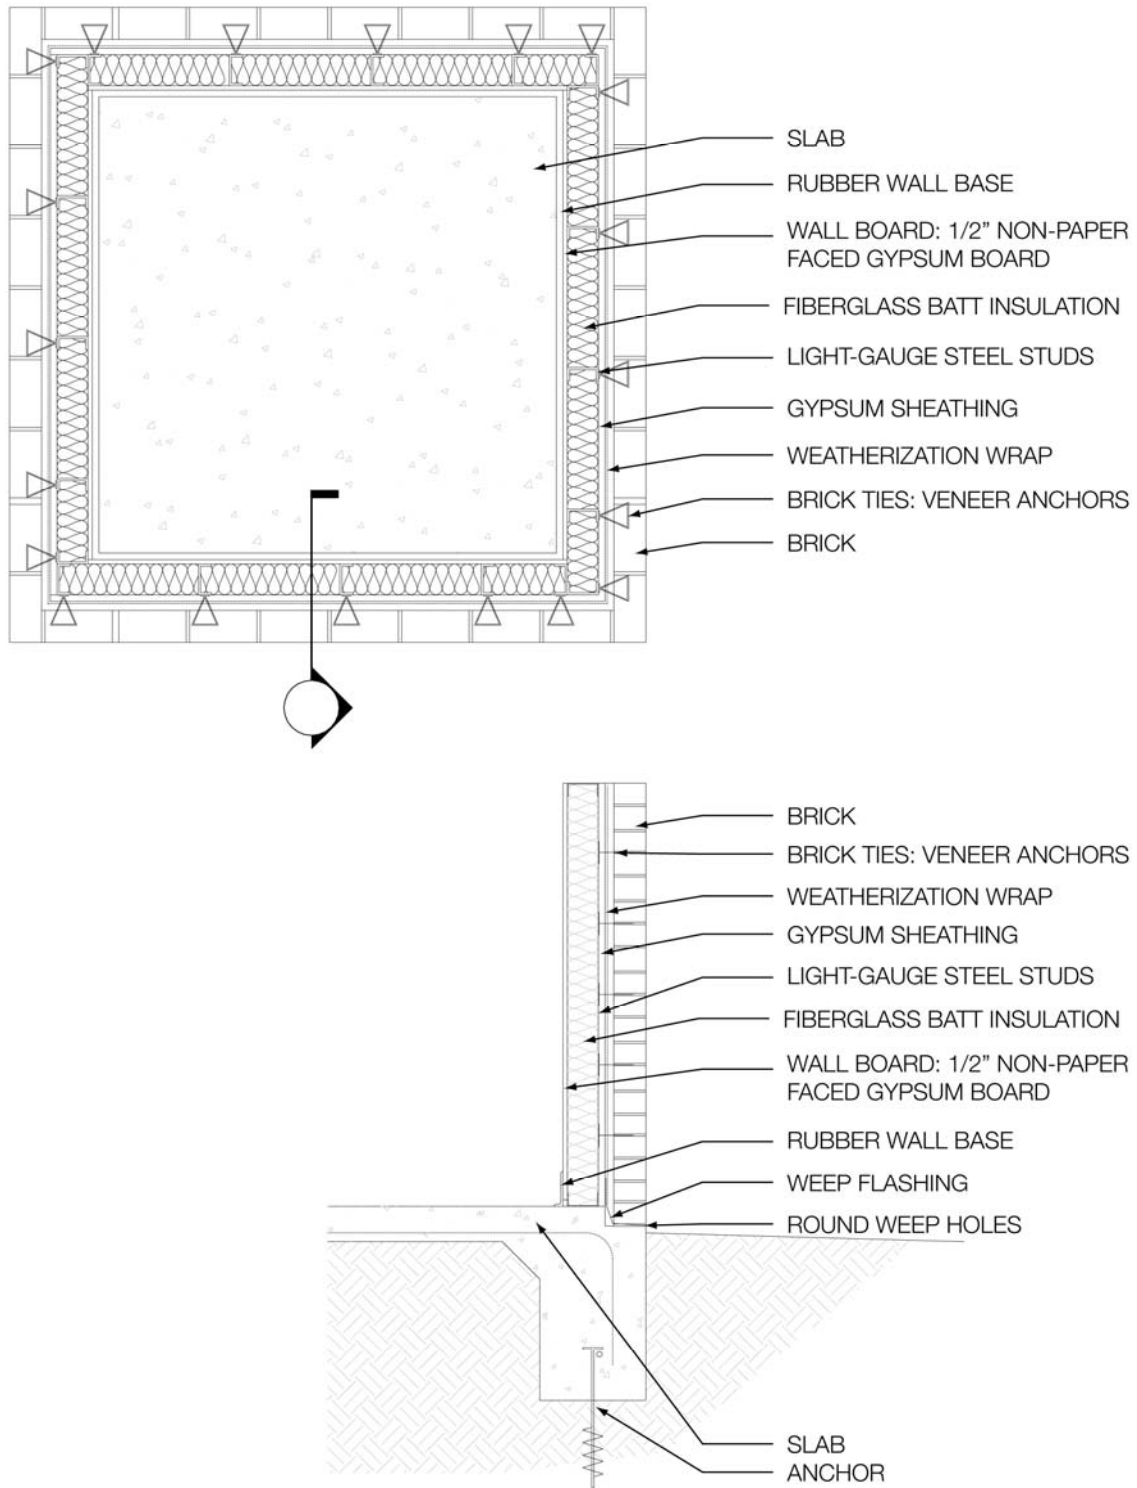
DIAGRAM: Detailed drawings, test pod E: metal stud.
